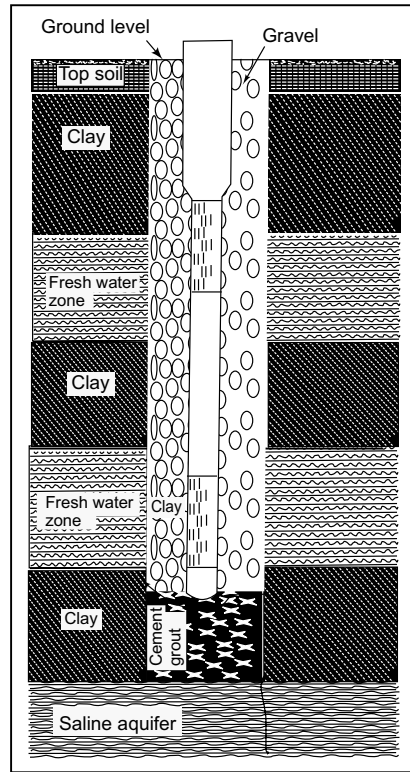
Sealing of bottom saline zone in a tube well by concrete grouting
